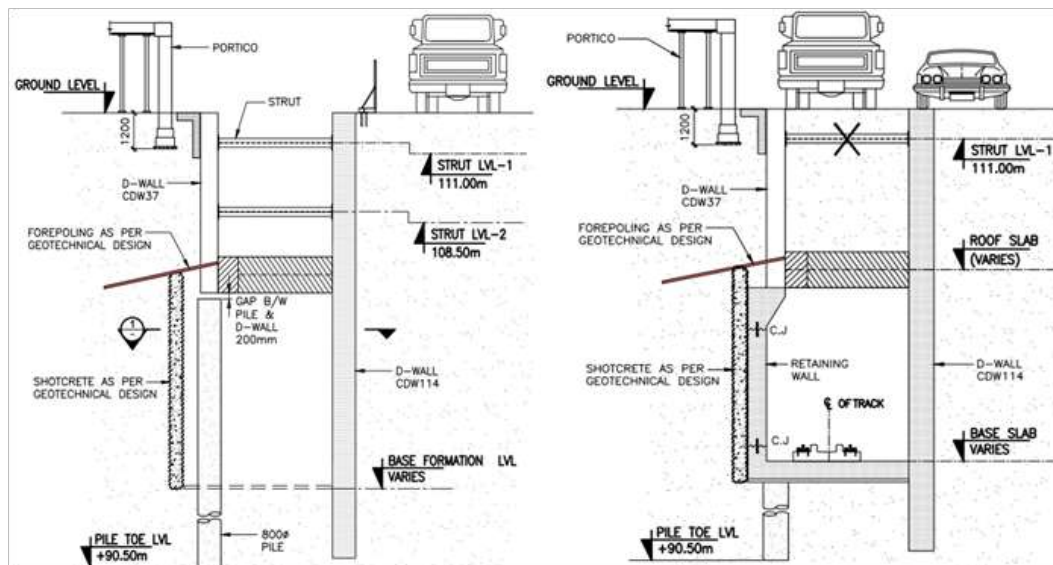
Cross Section showing the excavation below top slab of box tunnel (left side) and reinstating of road surface after casting and backfilling done (right side).
